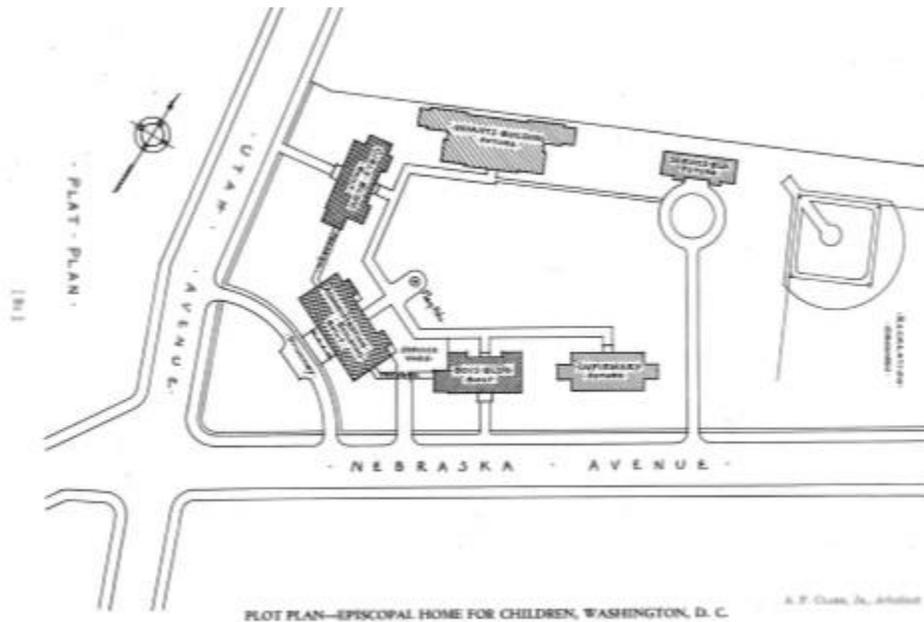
Original Site Plan showing the three (3) buildings that were constructed and three (3) additional buildings that were planned (Institutional Homes for Children).
